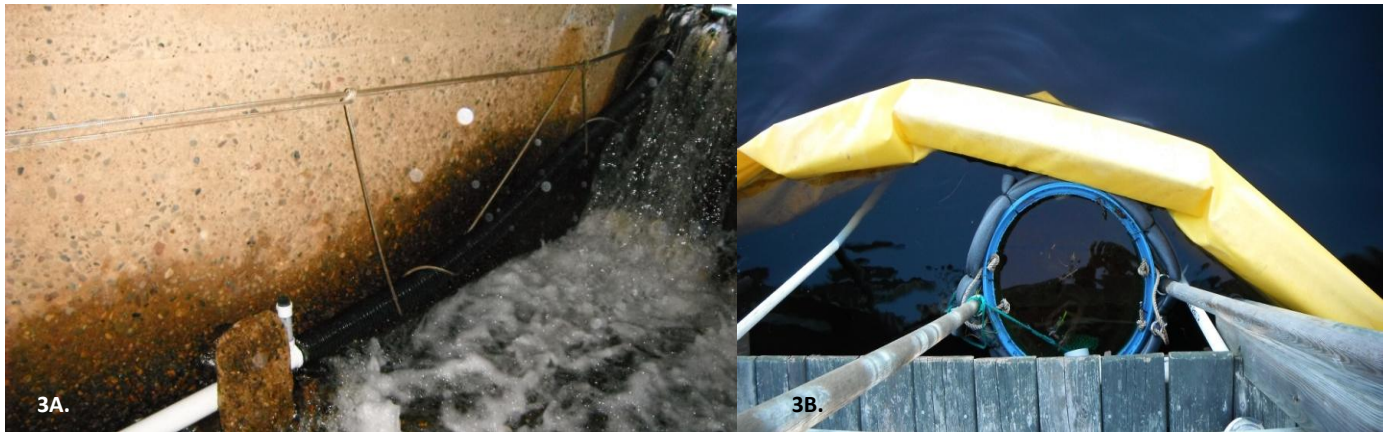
A & B. View of corrugated pipe extended below Route 9 at the Tuckerton Creek dam. Suspended with rope to allow better flow and angle of ascent (A) and water surface view of the live box constructed out of “deep tub, secured with floats and PVC piping for stabilization (B).
